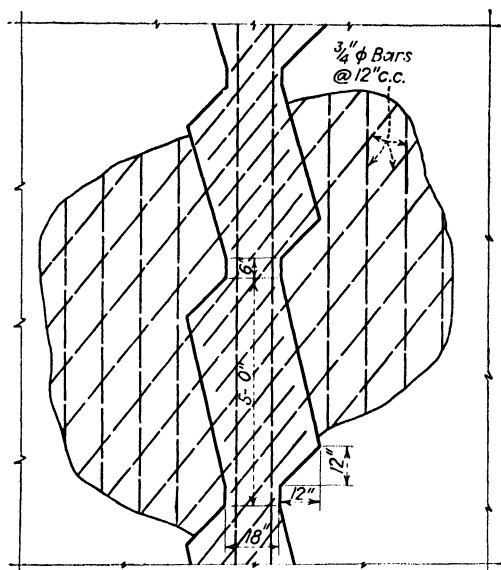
Bartlett Dam. Detail of vertical contraction joints.
